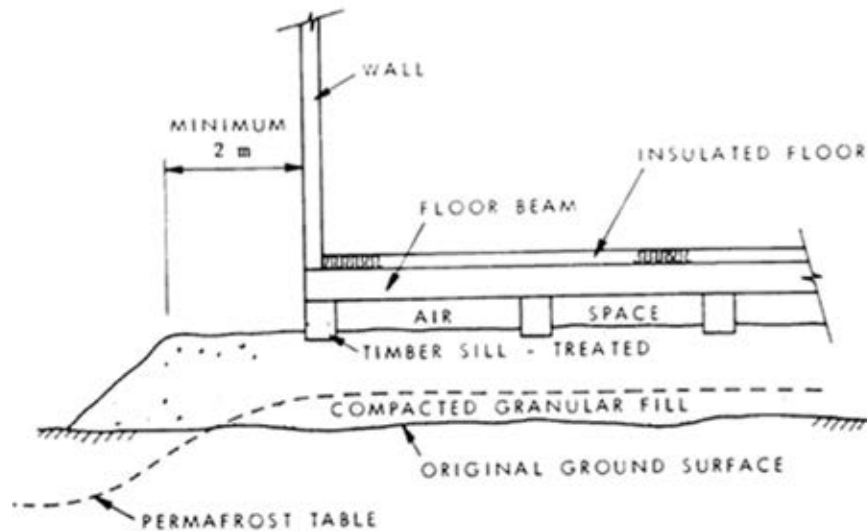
Shallow foundation on permafrost: typical timber sill surface foundation (after Johnston 1981)
